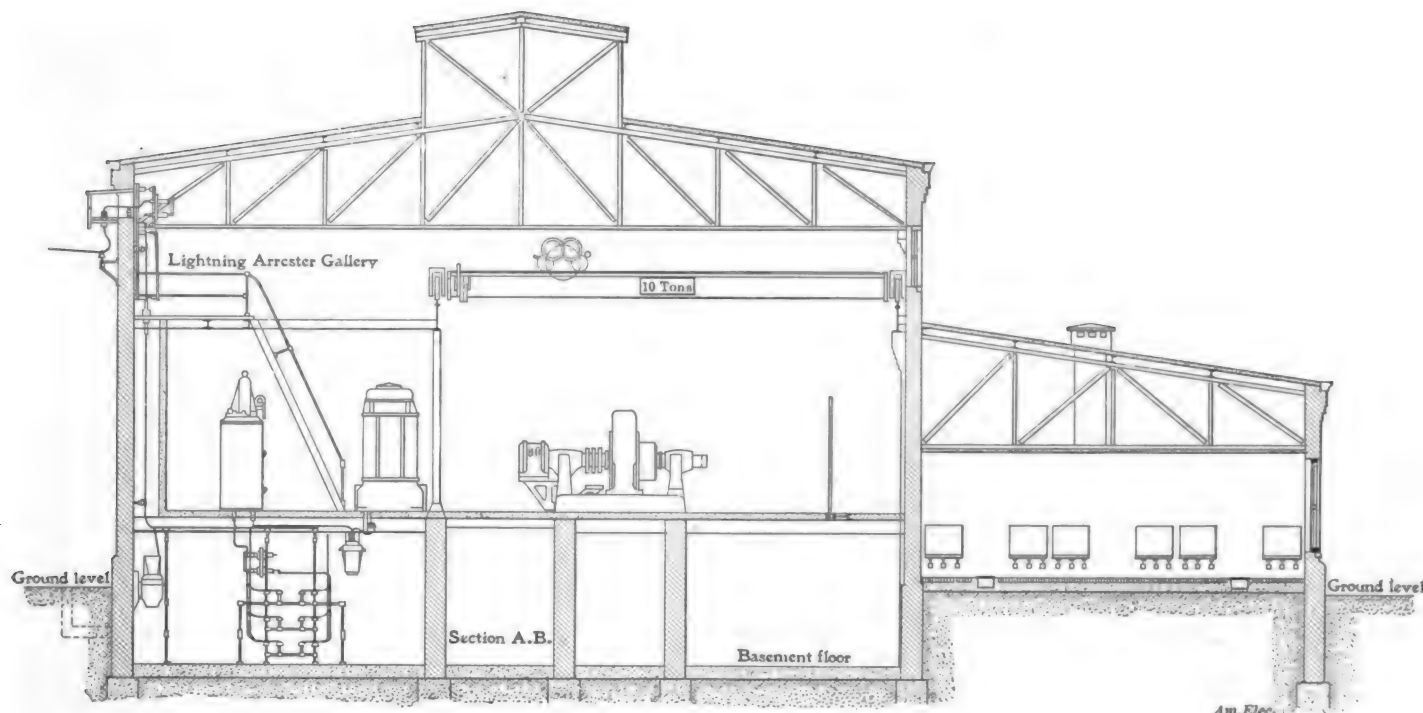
CROSS-SECTIONAL ELEVATION OF WATERBURY SUB-STATION NO. 1.
